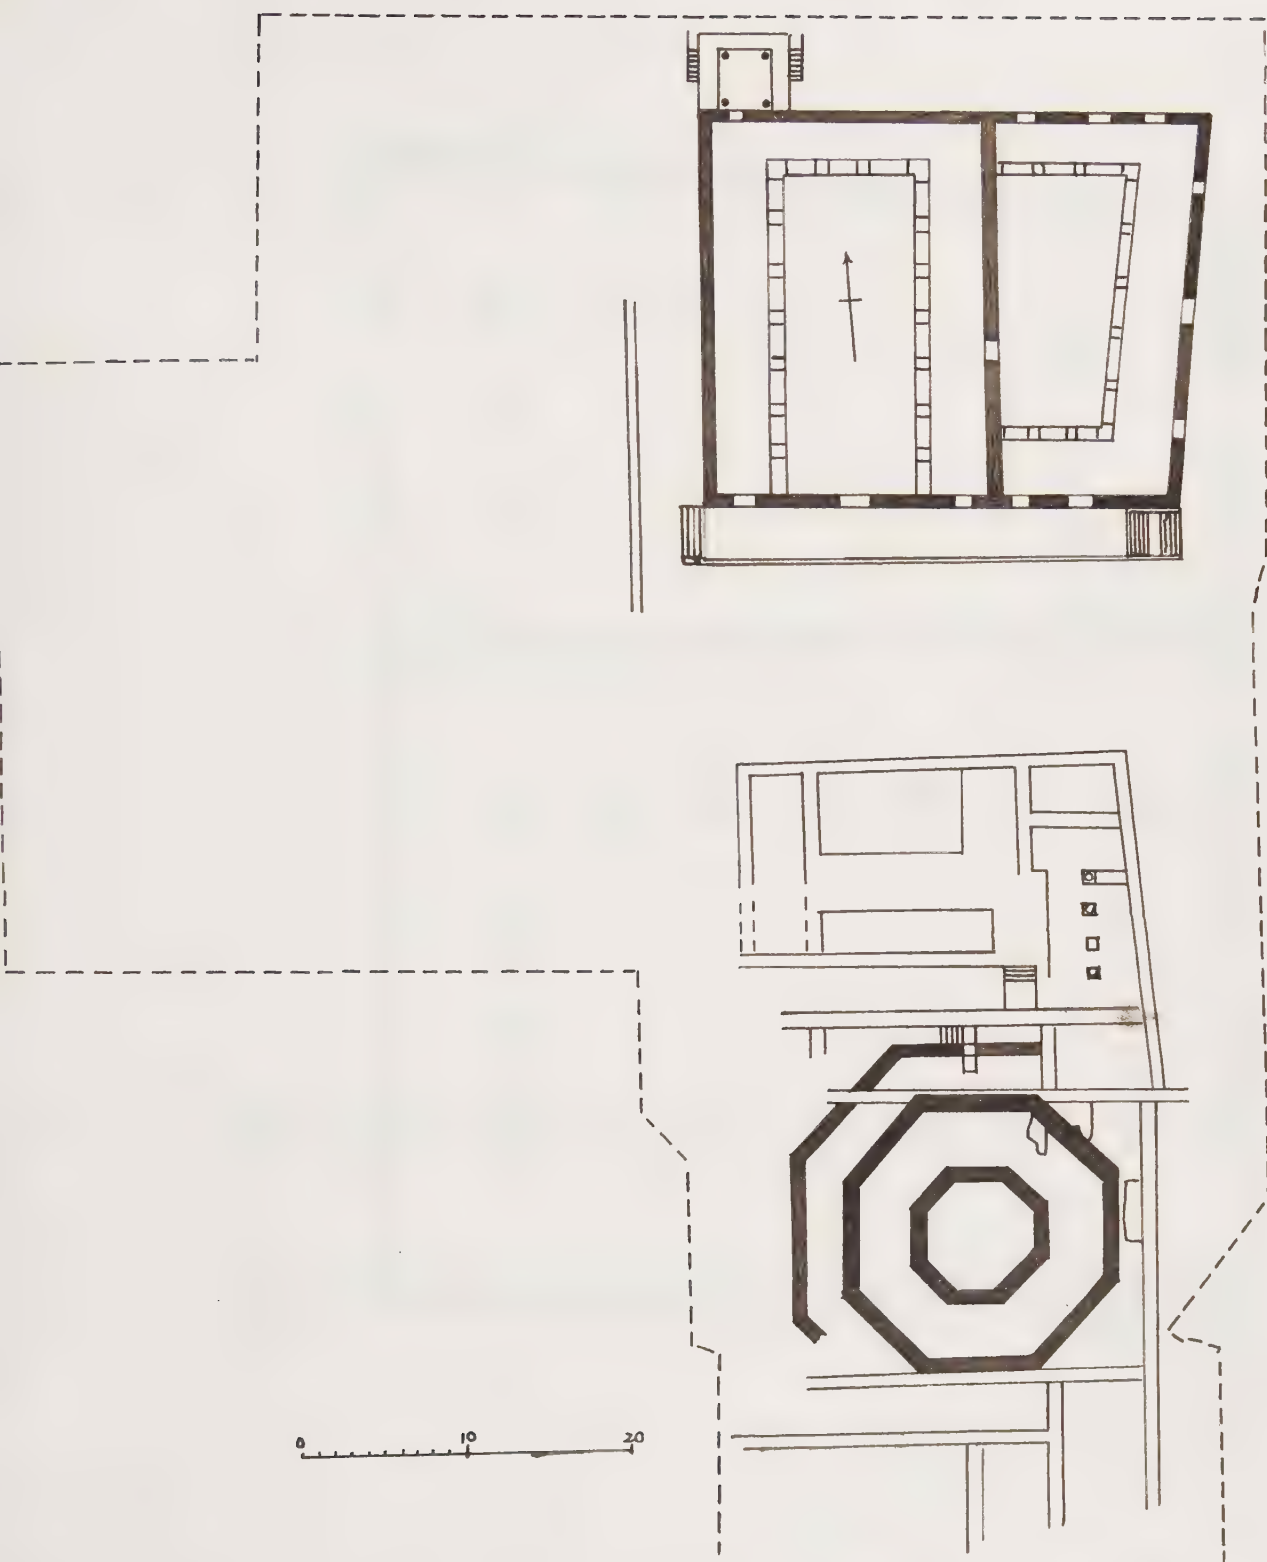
Plan of assembly of excavations at Tell Hūm
